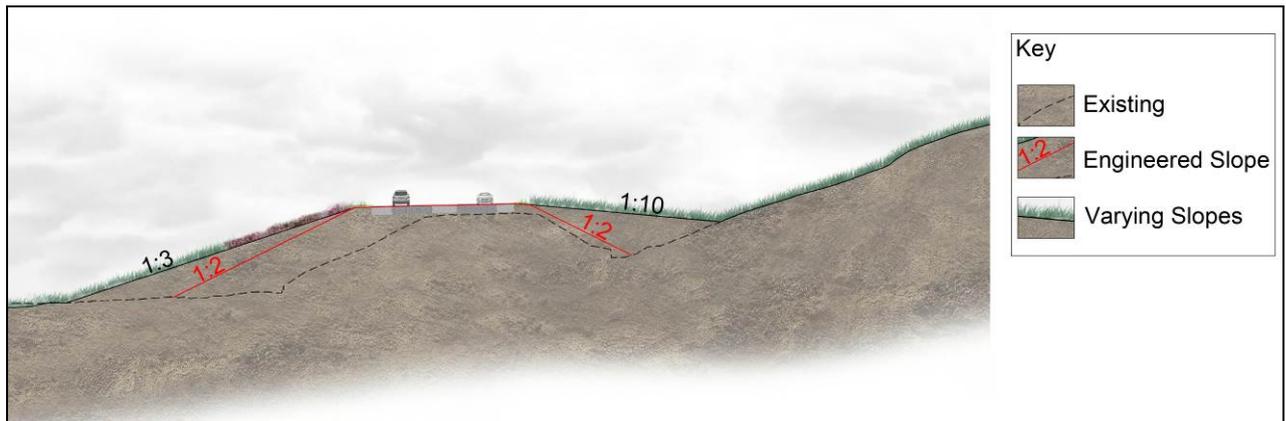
Illustrative cross-section showing typical landscaped earthworks slopes
